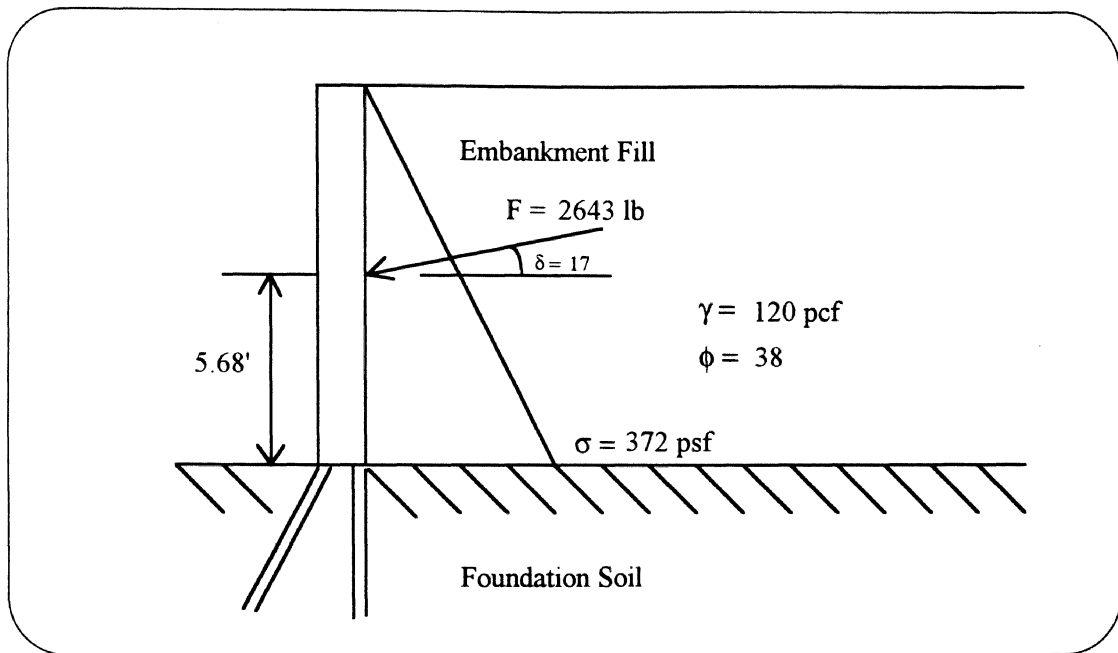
Lateral Earth Pressure, North Abutment Bridge C
